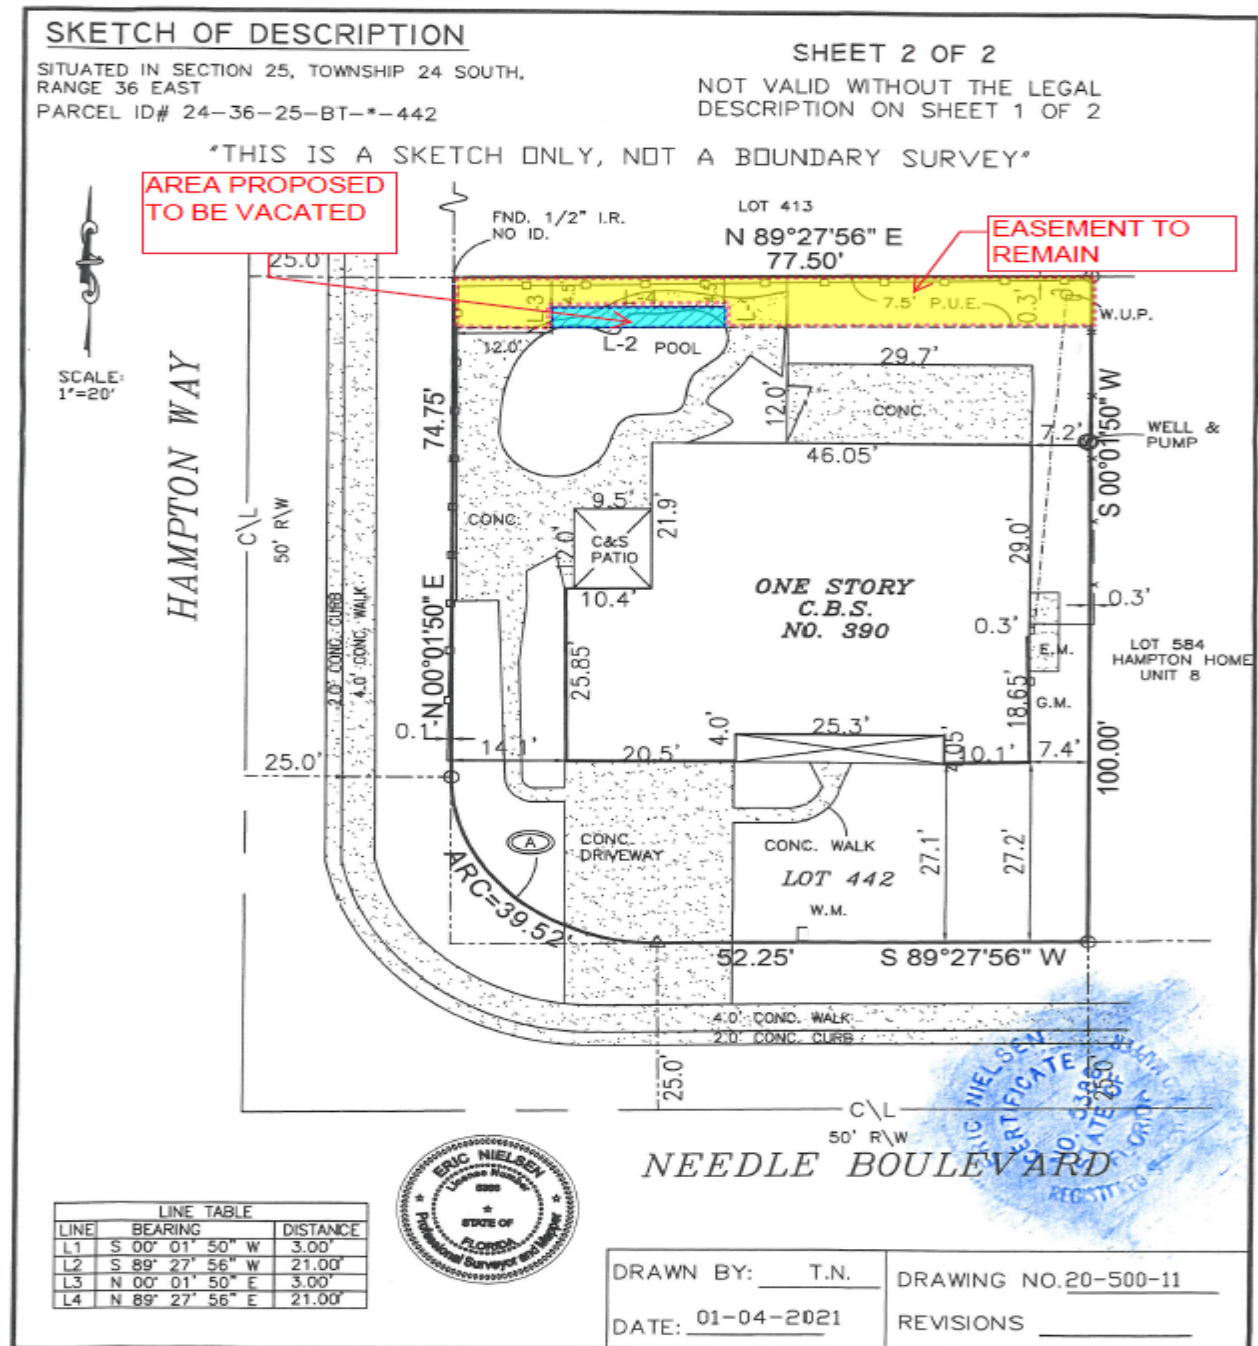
Sketch of Description. Situated in Section 25, Township 24 South, Range 36 East, Parent Parcel: #24-36-25-BT-*-442. Sheet 2 of 2. Not valid without legal description on sheet 1 of 2. Sketch illustrates a 3.0-foot strip of a 7.5-foot easement lying on the North side of Lot 442, Hampton Homes Unit 7, 390 Needle Blvd., Merritt Island, Florida. The coordinates of the area depicted is as follows moving North to East clockwise. North boundary – North 89°27'56" East 77.50'; East boundary South 00°01'50" West 100.00', South boundary – South 89°27'56" West 52.25'. Prepared by: Eric Nielsen Land Surveying, Inc., FL LB# 6946. Drawing NO: 20-500-11.
